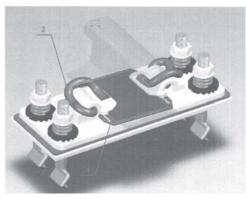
Rail – tie fastening (1 – rail, 2 – fastening, 3 - tie)
